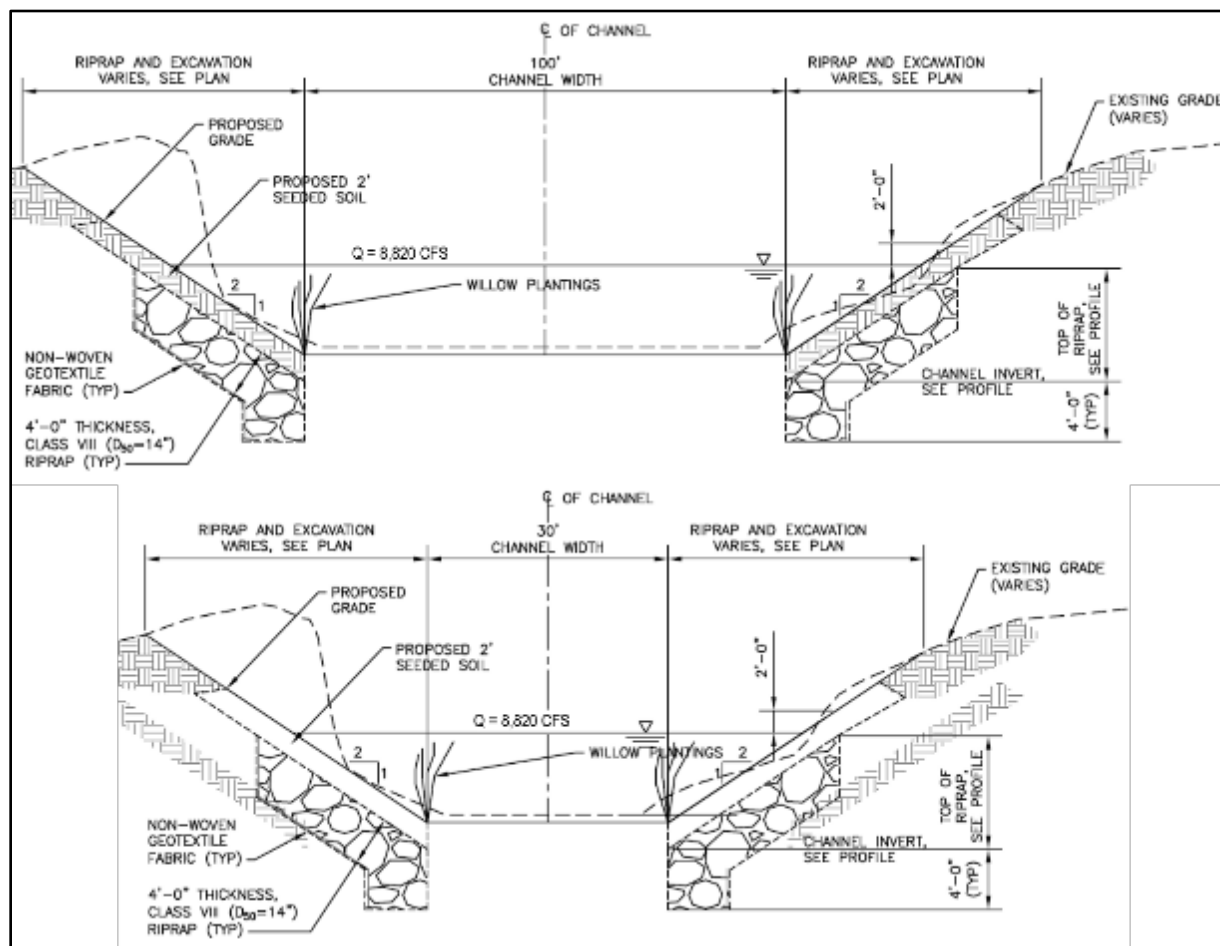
Riprap Channel Cross Sections (8,820 cfs) 30 ft and 100 ft Widths
